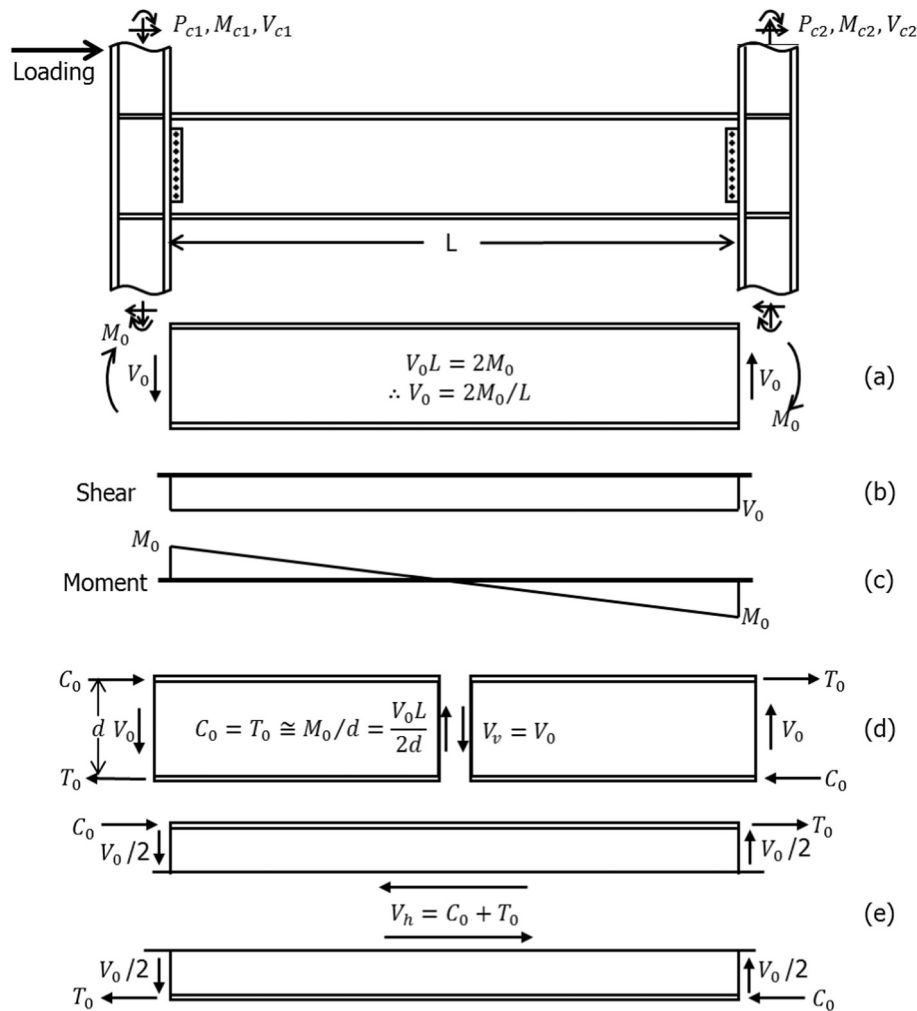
Static equilibriums in a beam-column moment frame under lateral loading.
